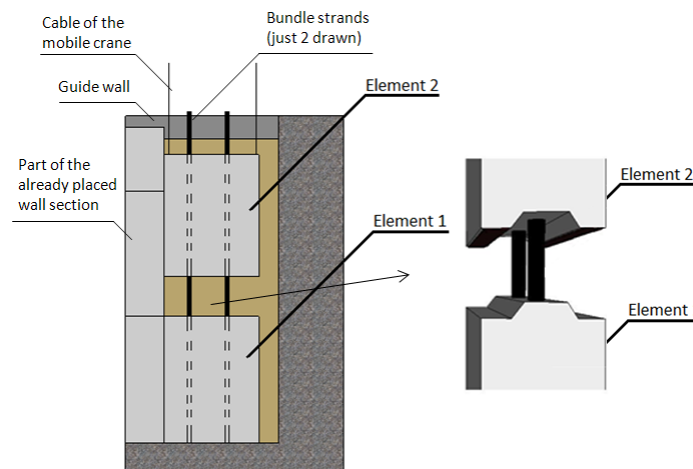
Placement of the second element (left) and detail horizontal connection (right)
